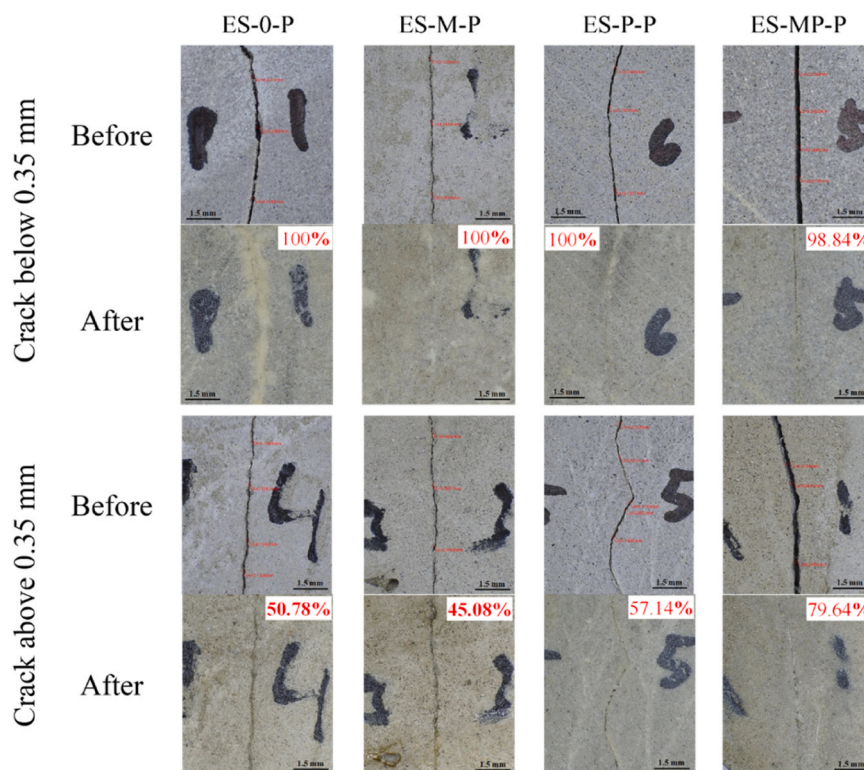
Cracks surface of cement paste specimens before and after EICP(S) treatment.
